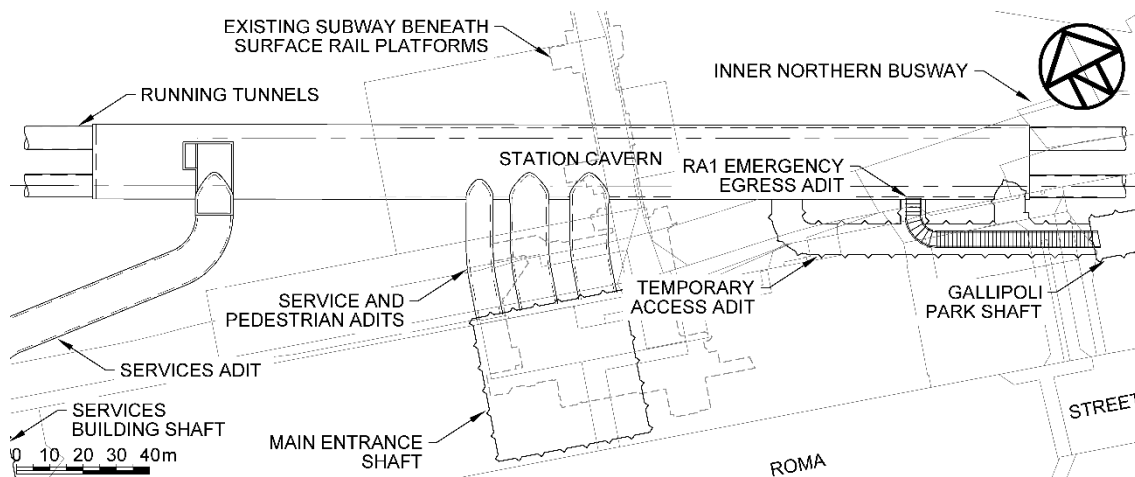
Roma Street station layout showing temporary access adit and emergency egress adit.
